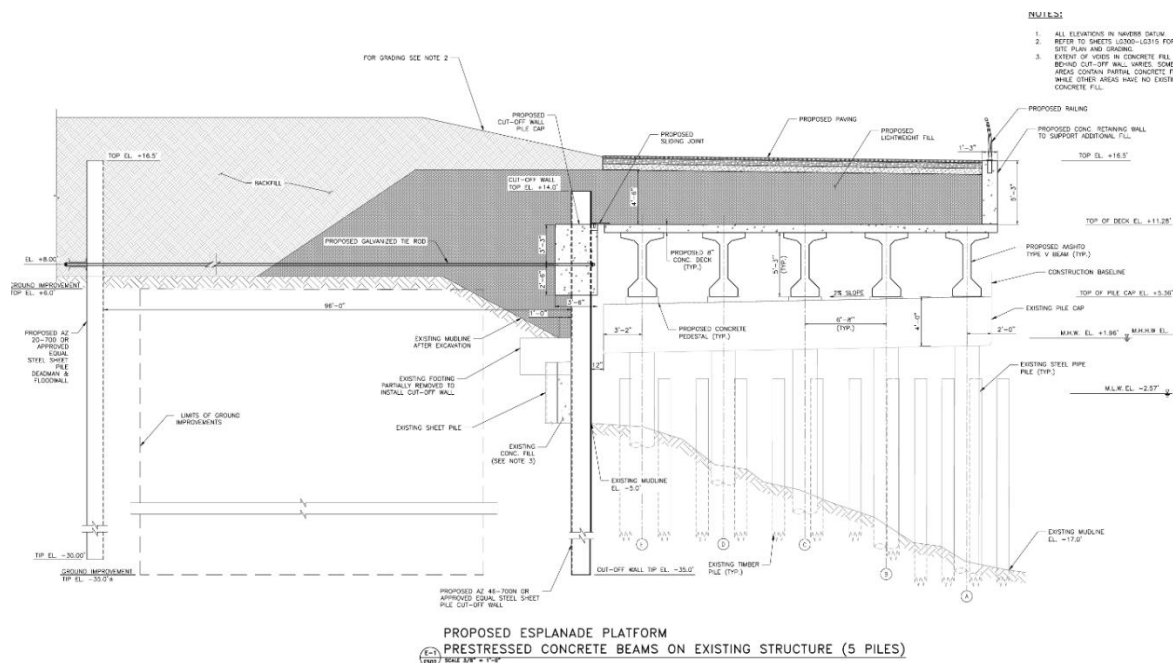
Proposed cross-section at elevated park waterfront (buried floodwall not shown)
